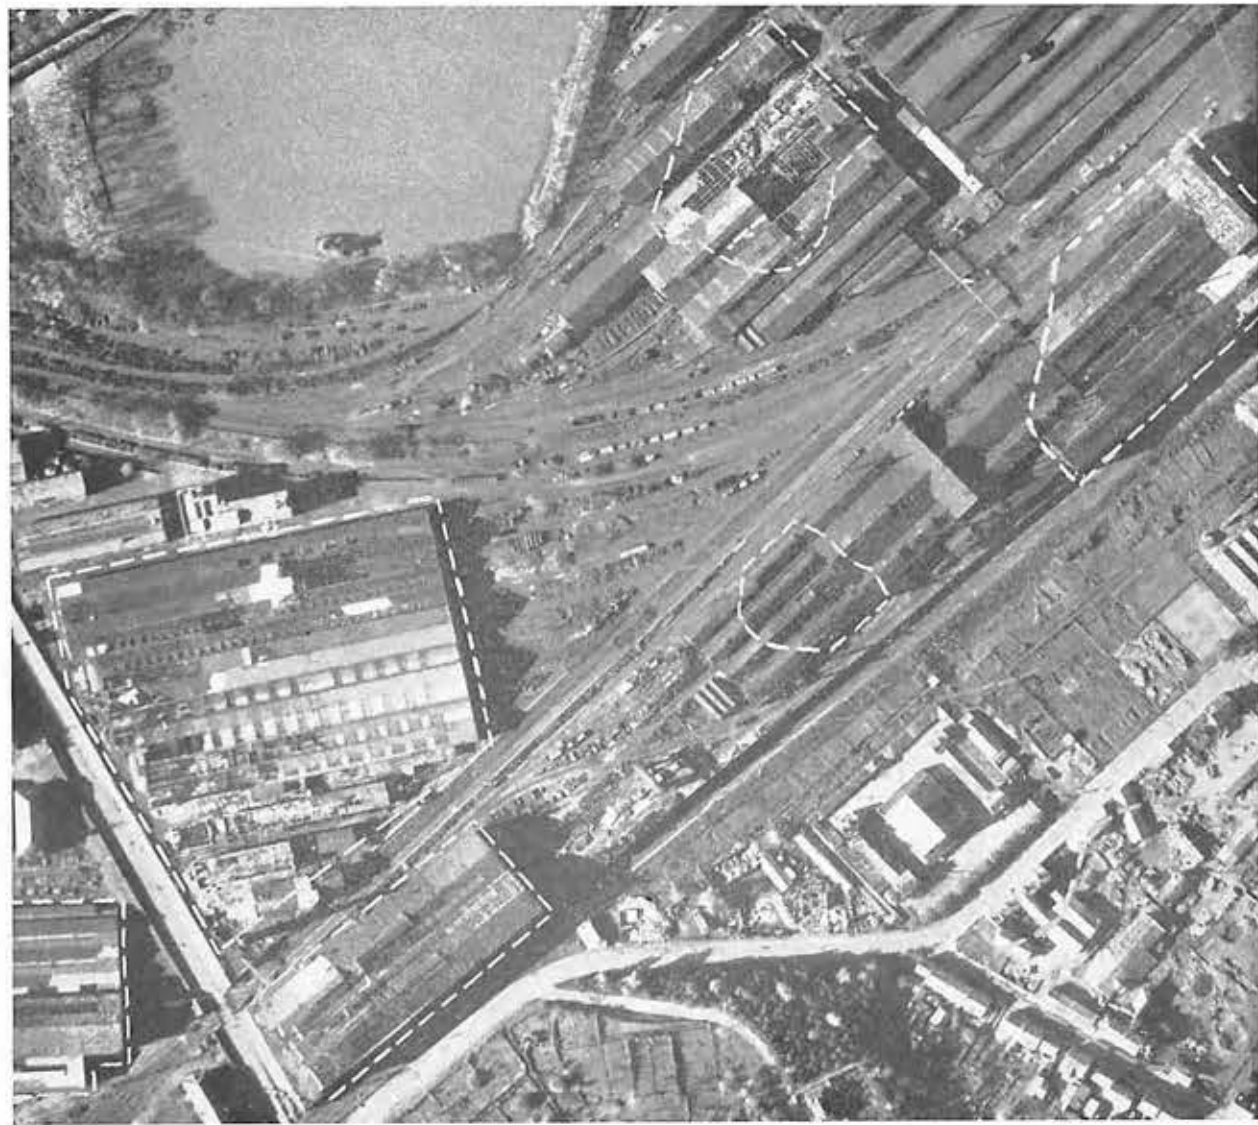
The Tank or Turbine Construction Shop shows fire damage over 100,000 square feet. The other damaged buildings are sections of the Forging Department.
